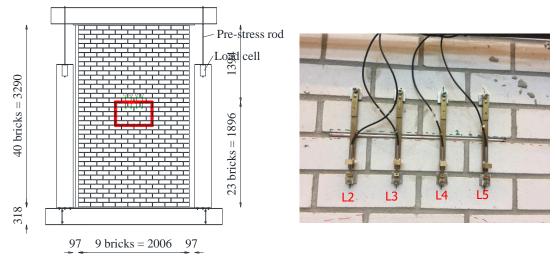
Test set-up for single flatjack test at location 02. The dimensions are in mm.
